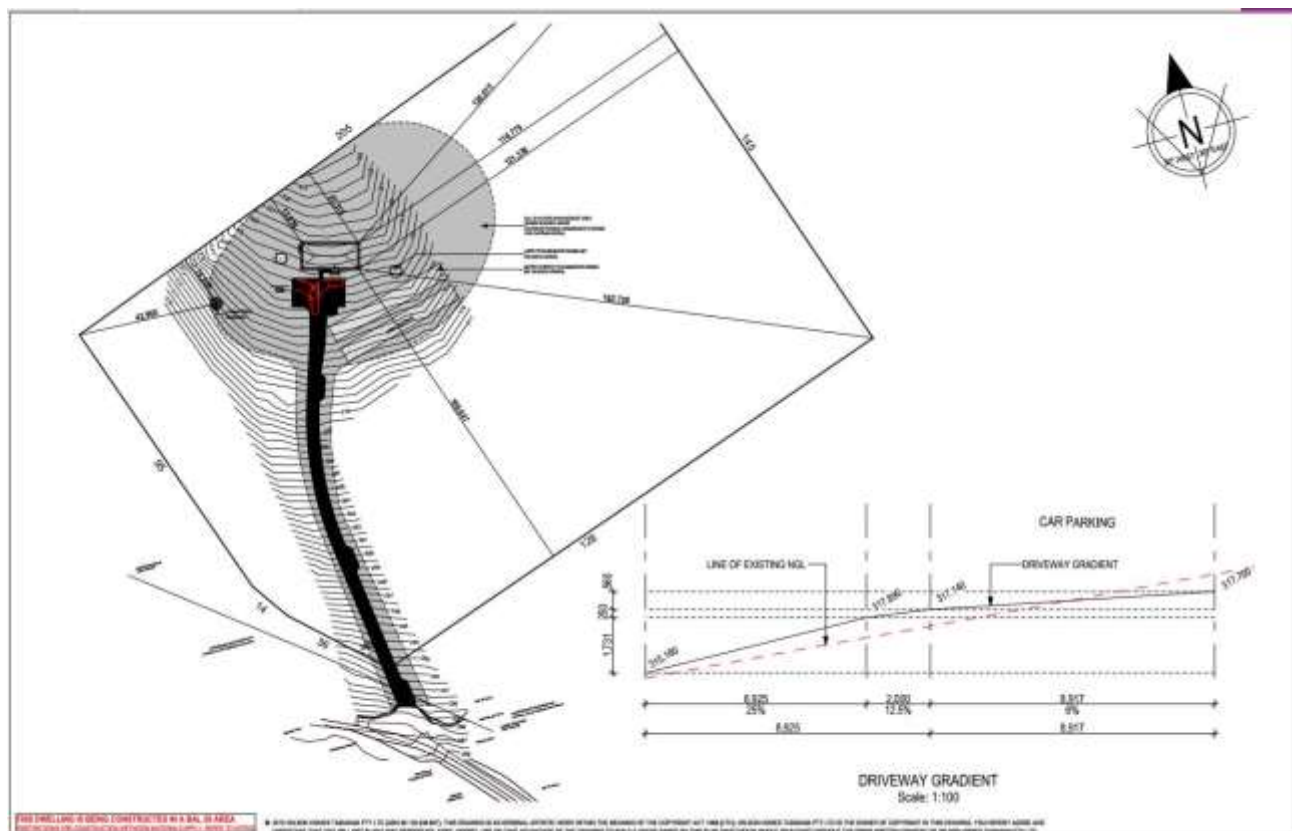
Site plan of proposed development showing location of access and dwelling and gradients of access.
